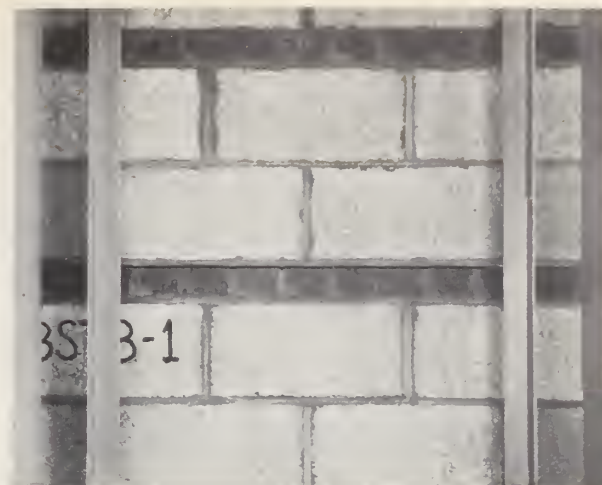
Typical flexural bond failure in block backing of composite wall.
